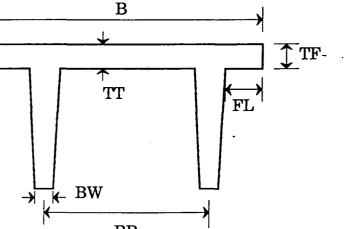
DEFAULT GIRDER SECTION DIMENSIONS В TT
